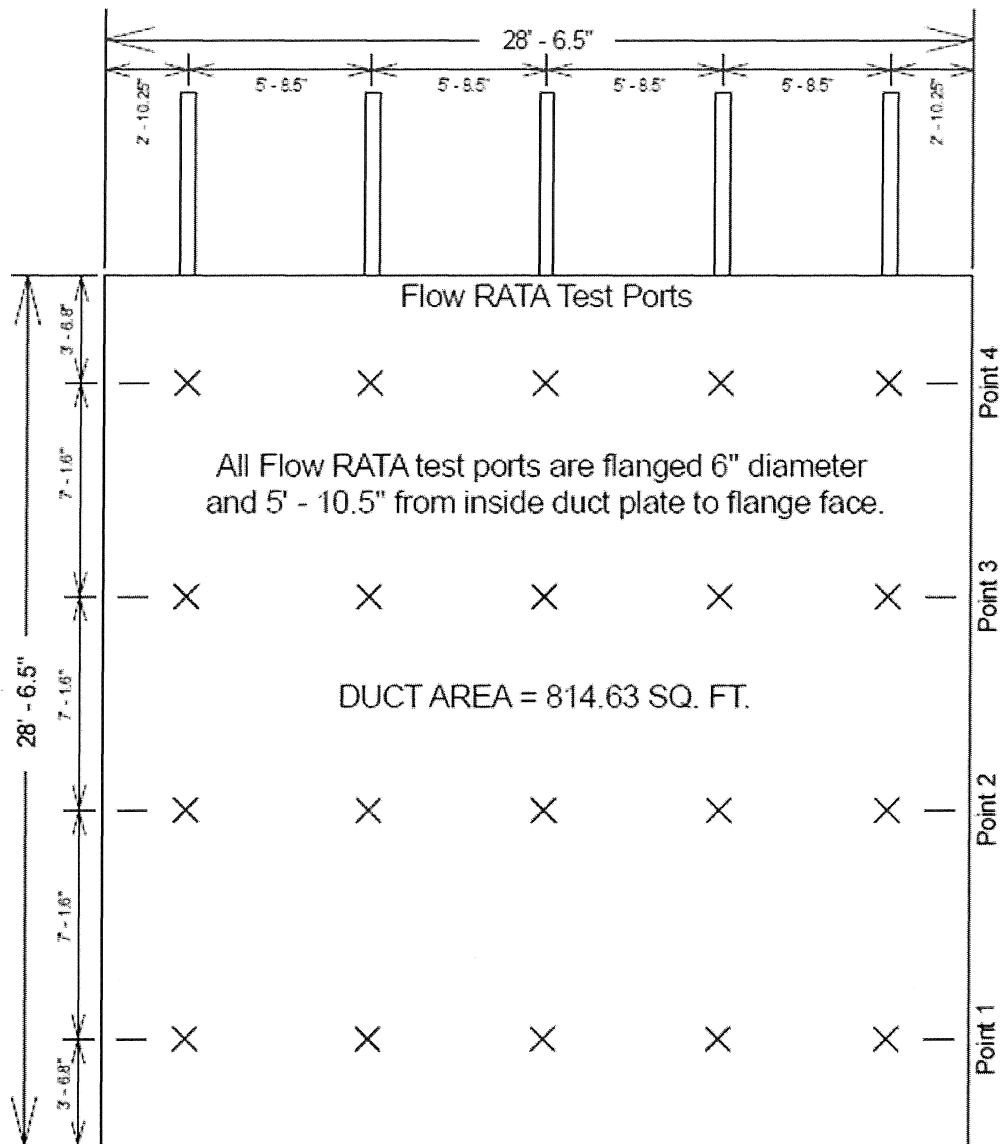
J.H. Campbell Unit 3 Duct Cross Section and Gas Sample Port Detail
